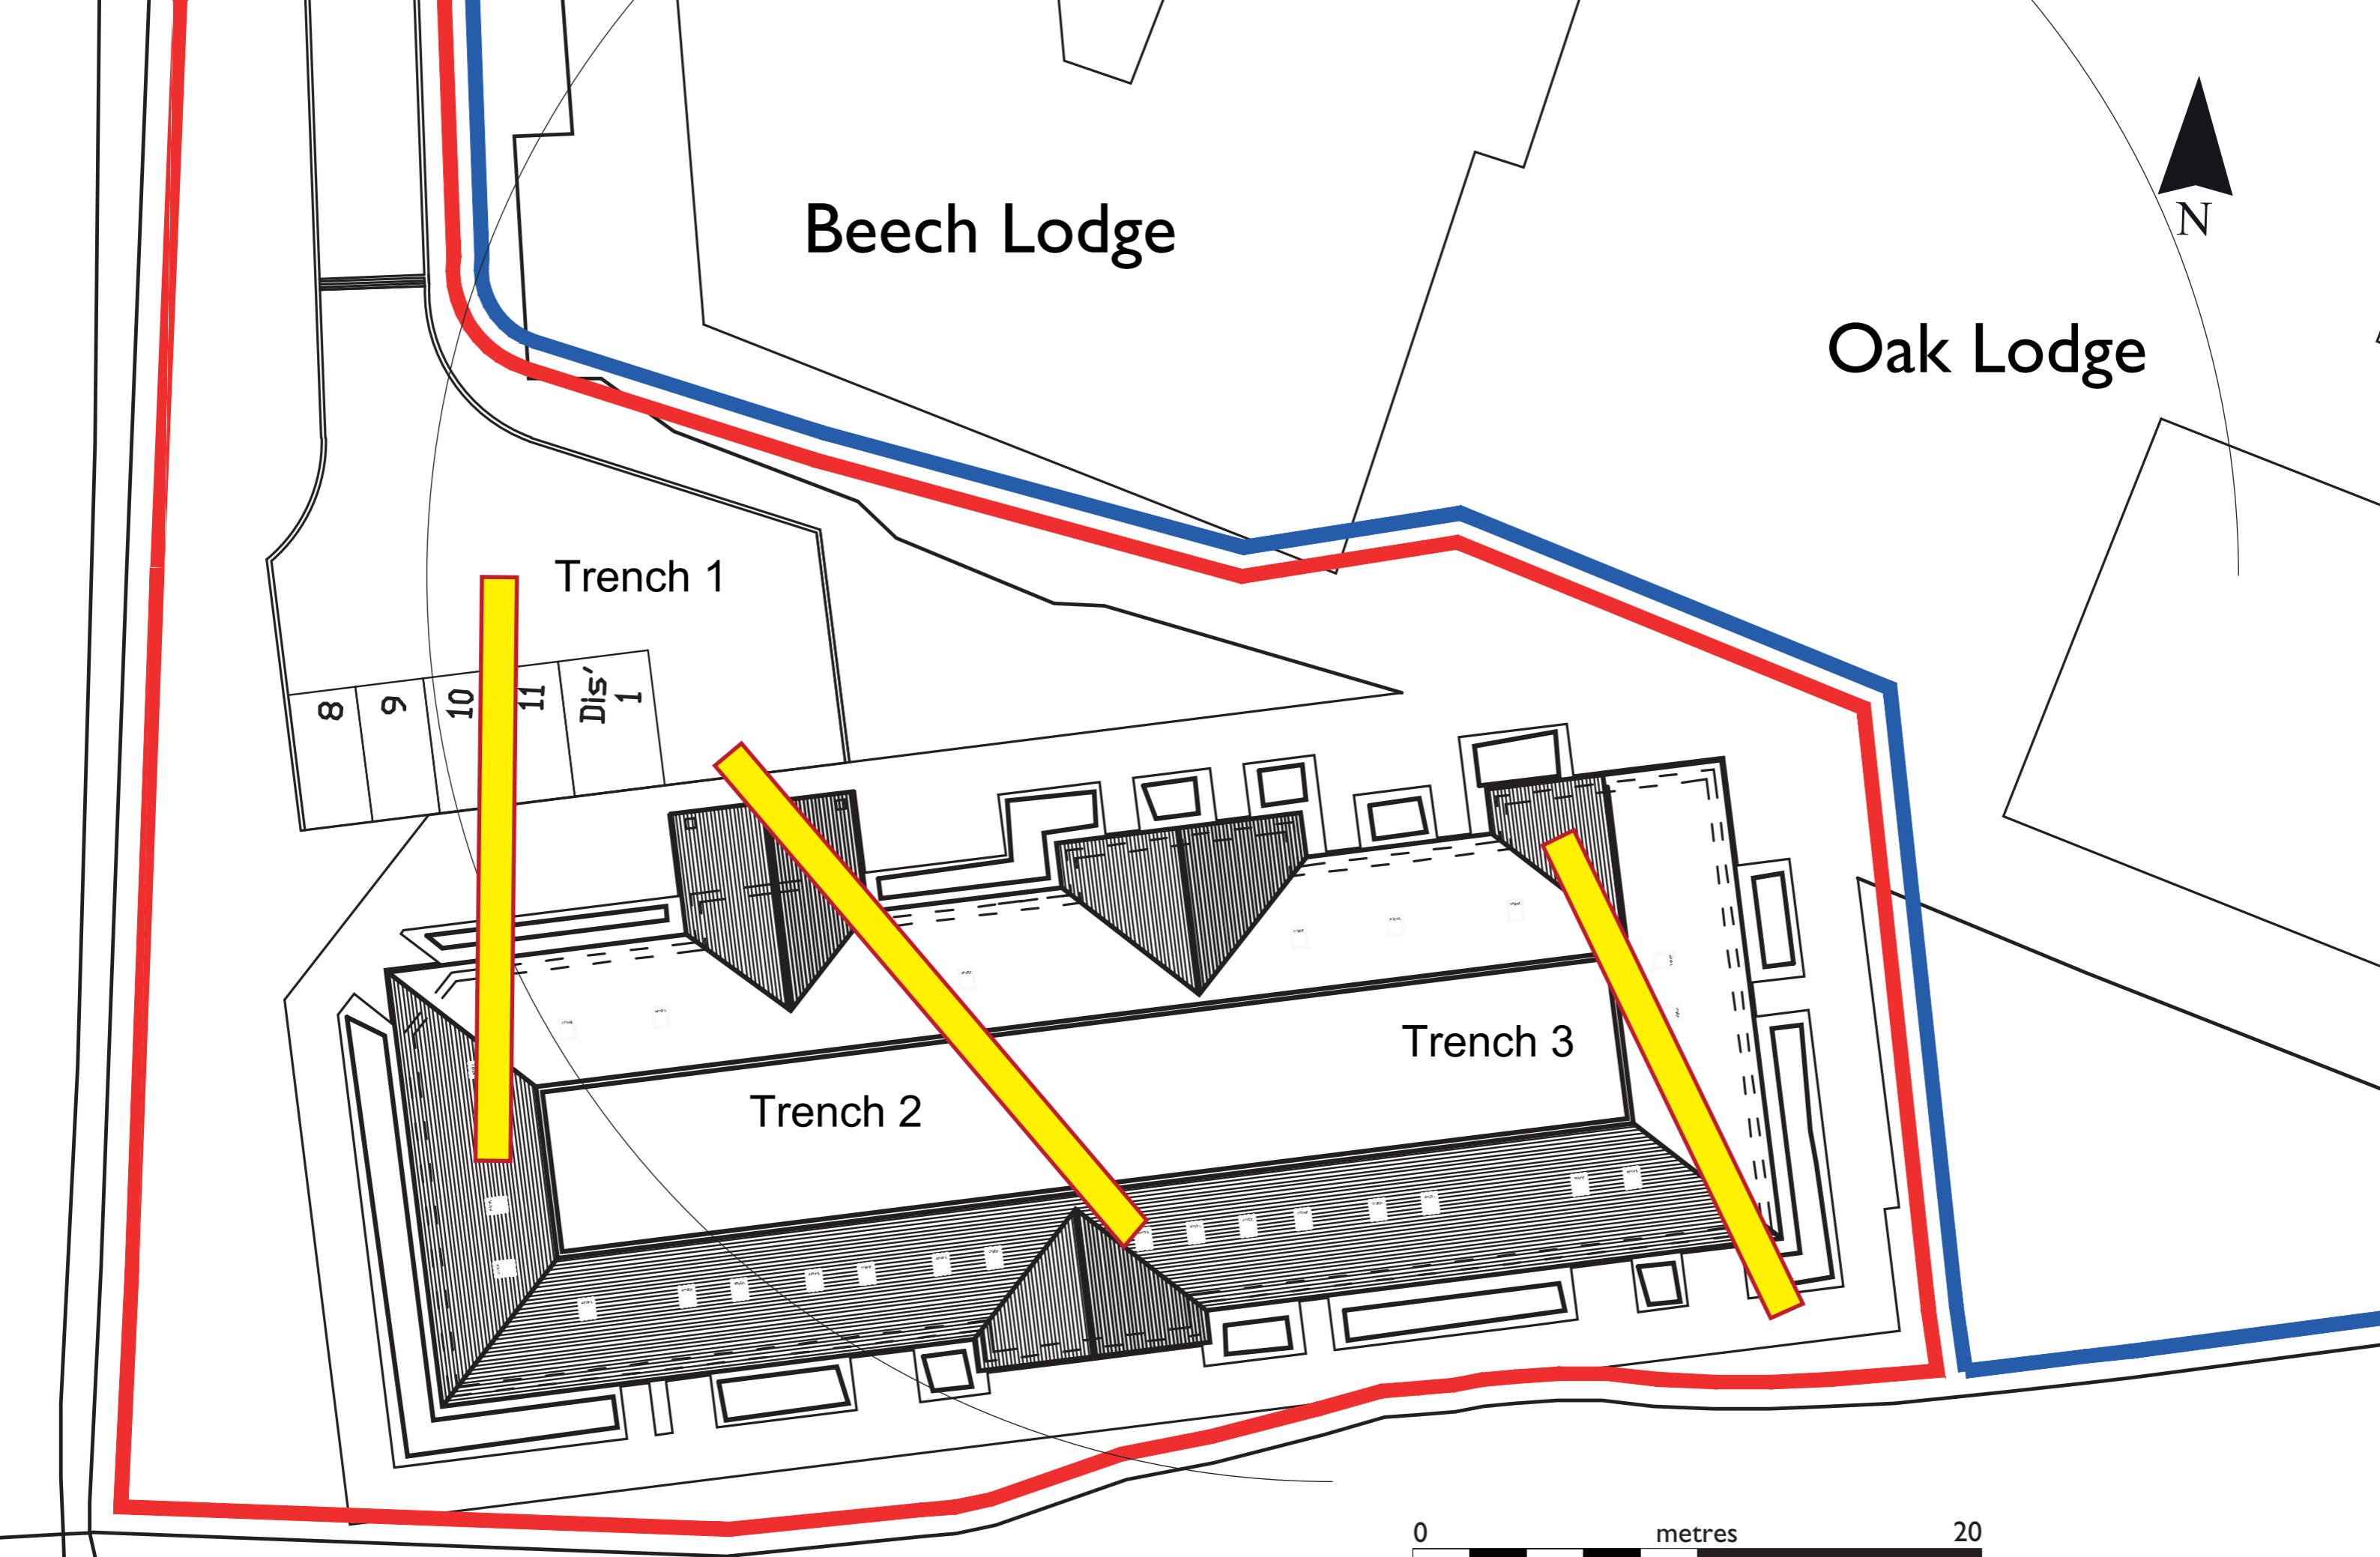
; Clemsfold House, Horsham, West Sussex. Actual trench locations
